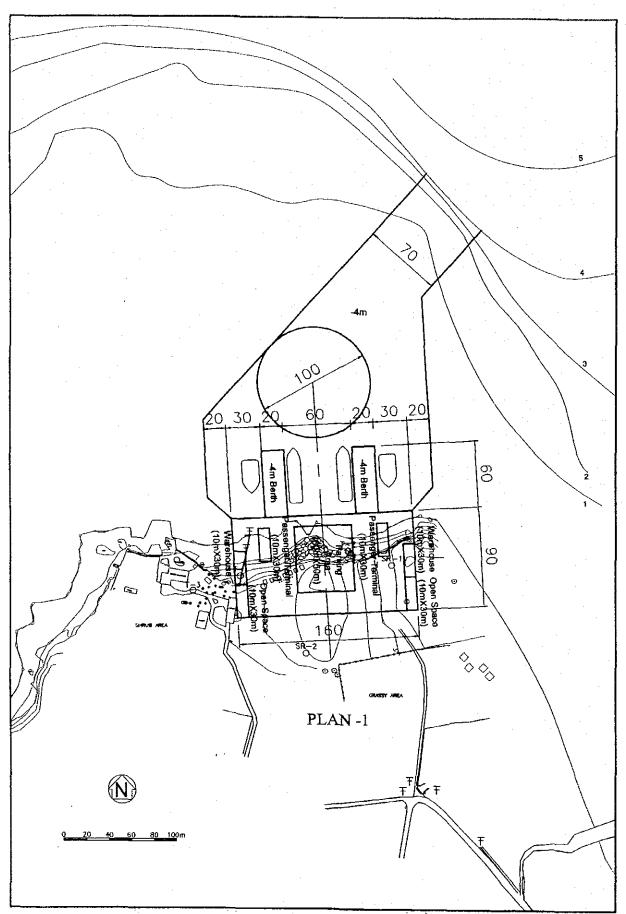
The New San Remigio Port Master Plan 1
